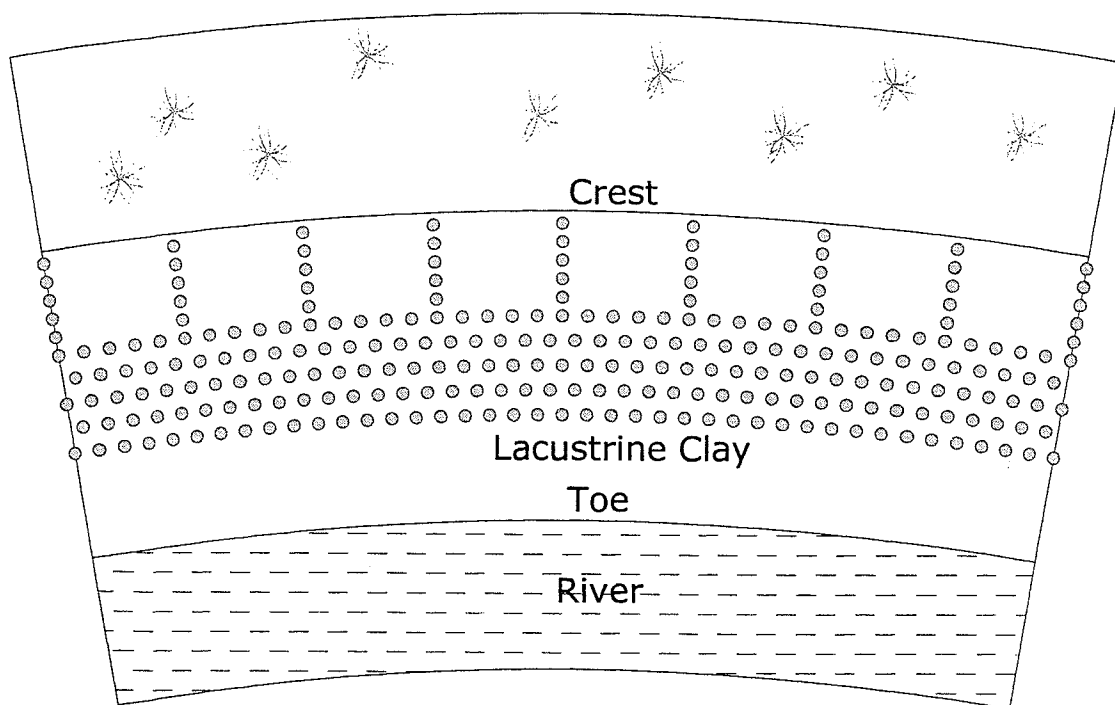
Stabilization of riverbank using rockfill columns following shear key and rib-type patterns
